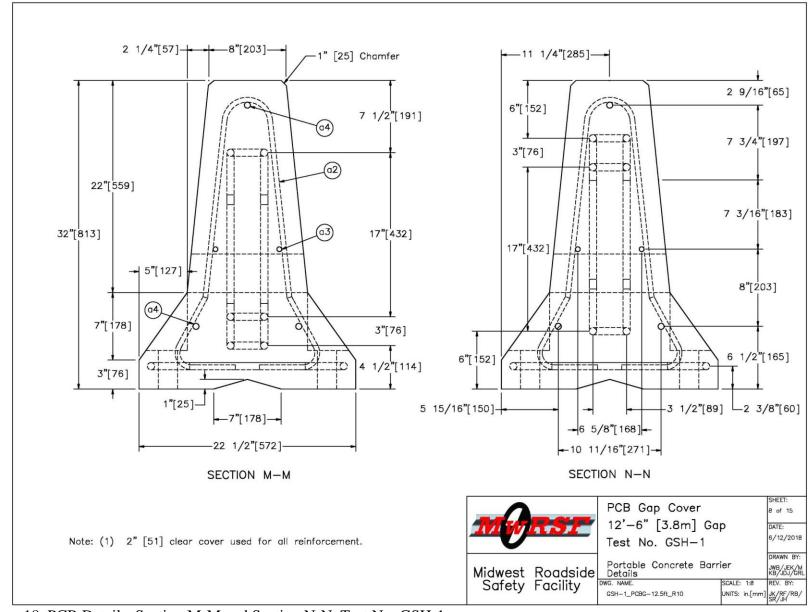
PCB Details, Section M-M and Section N-N, Test No. GSH-1
